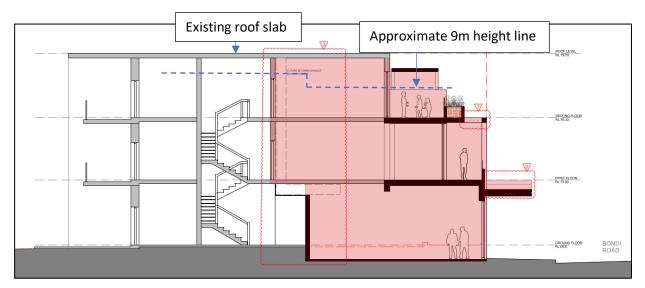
Only a small portion of the constructed works to the front of the building exceeds the 9m height limit, with the remainder below the existing roof slab. (Source: SHED, 2021)
